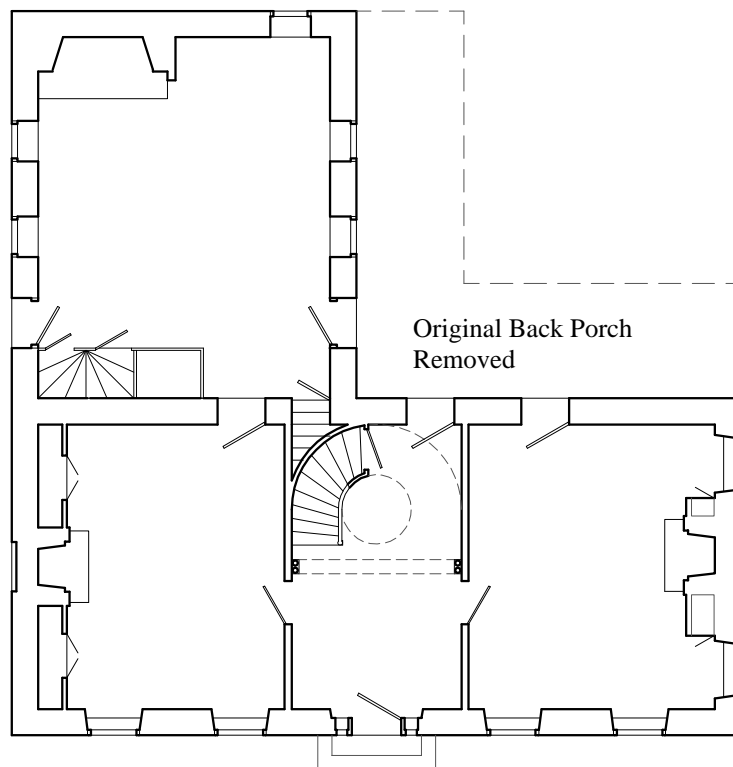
First floor plan of the Thomas^{IV} Barber house showing separation of front rooms and formal stair hall circulation from the back kitchen wing and service stairs.
